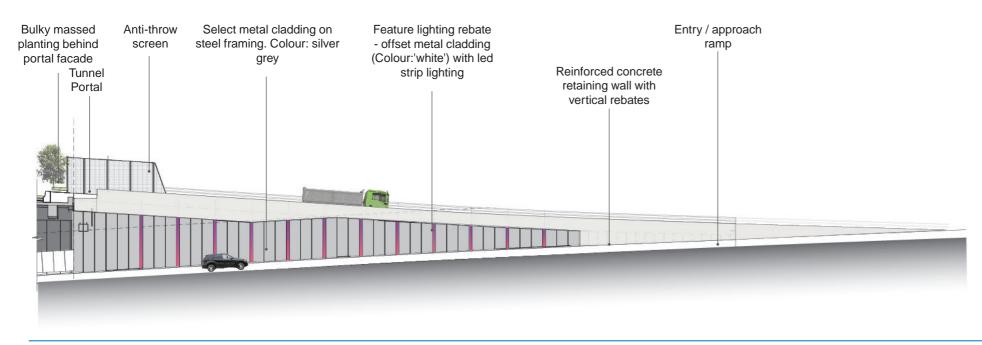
Iron Cove Link - Tunnel portal dive wall - south elevation
